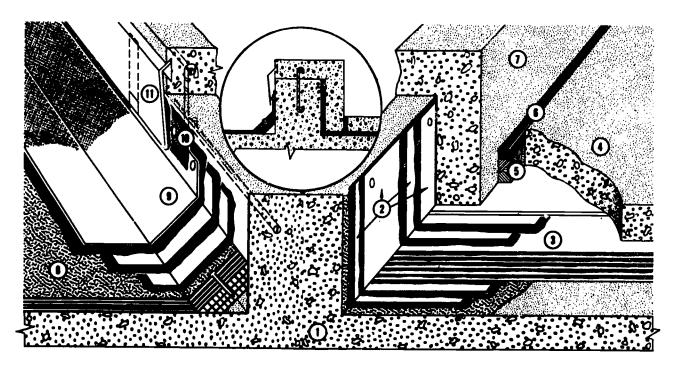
Five-course plastic cap flashing for parapet walls less than 18 inches (45.7 centimetres) high
